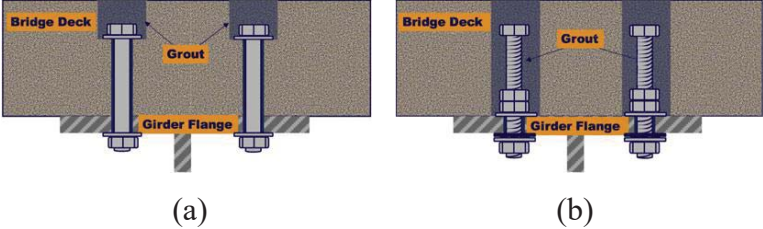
(a) High-tension friction-grip bolt assembly. (b) Double nut bolt assembly. (Kwon et al., 2010).
